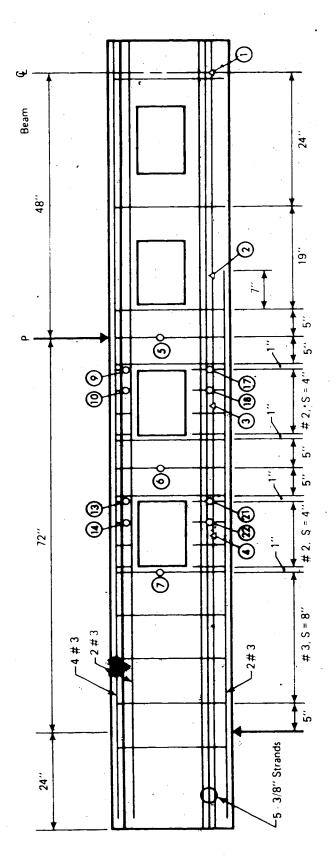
Reinforcement Details and Strain Gage Locations for Beam 16-12-6
